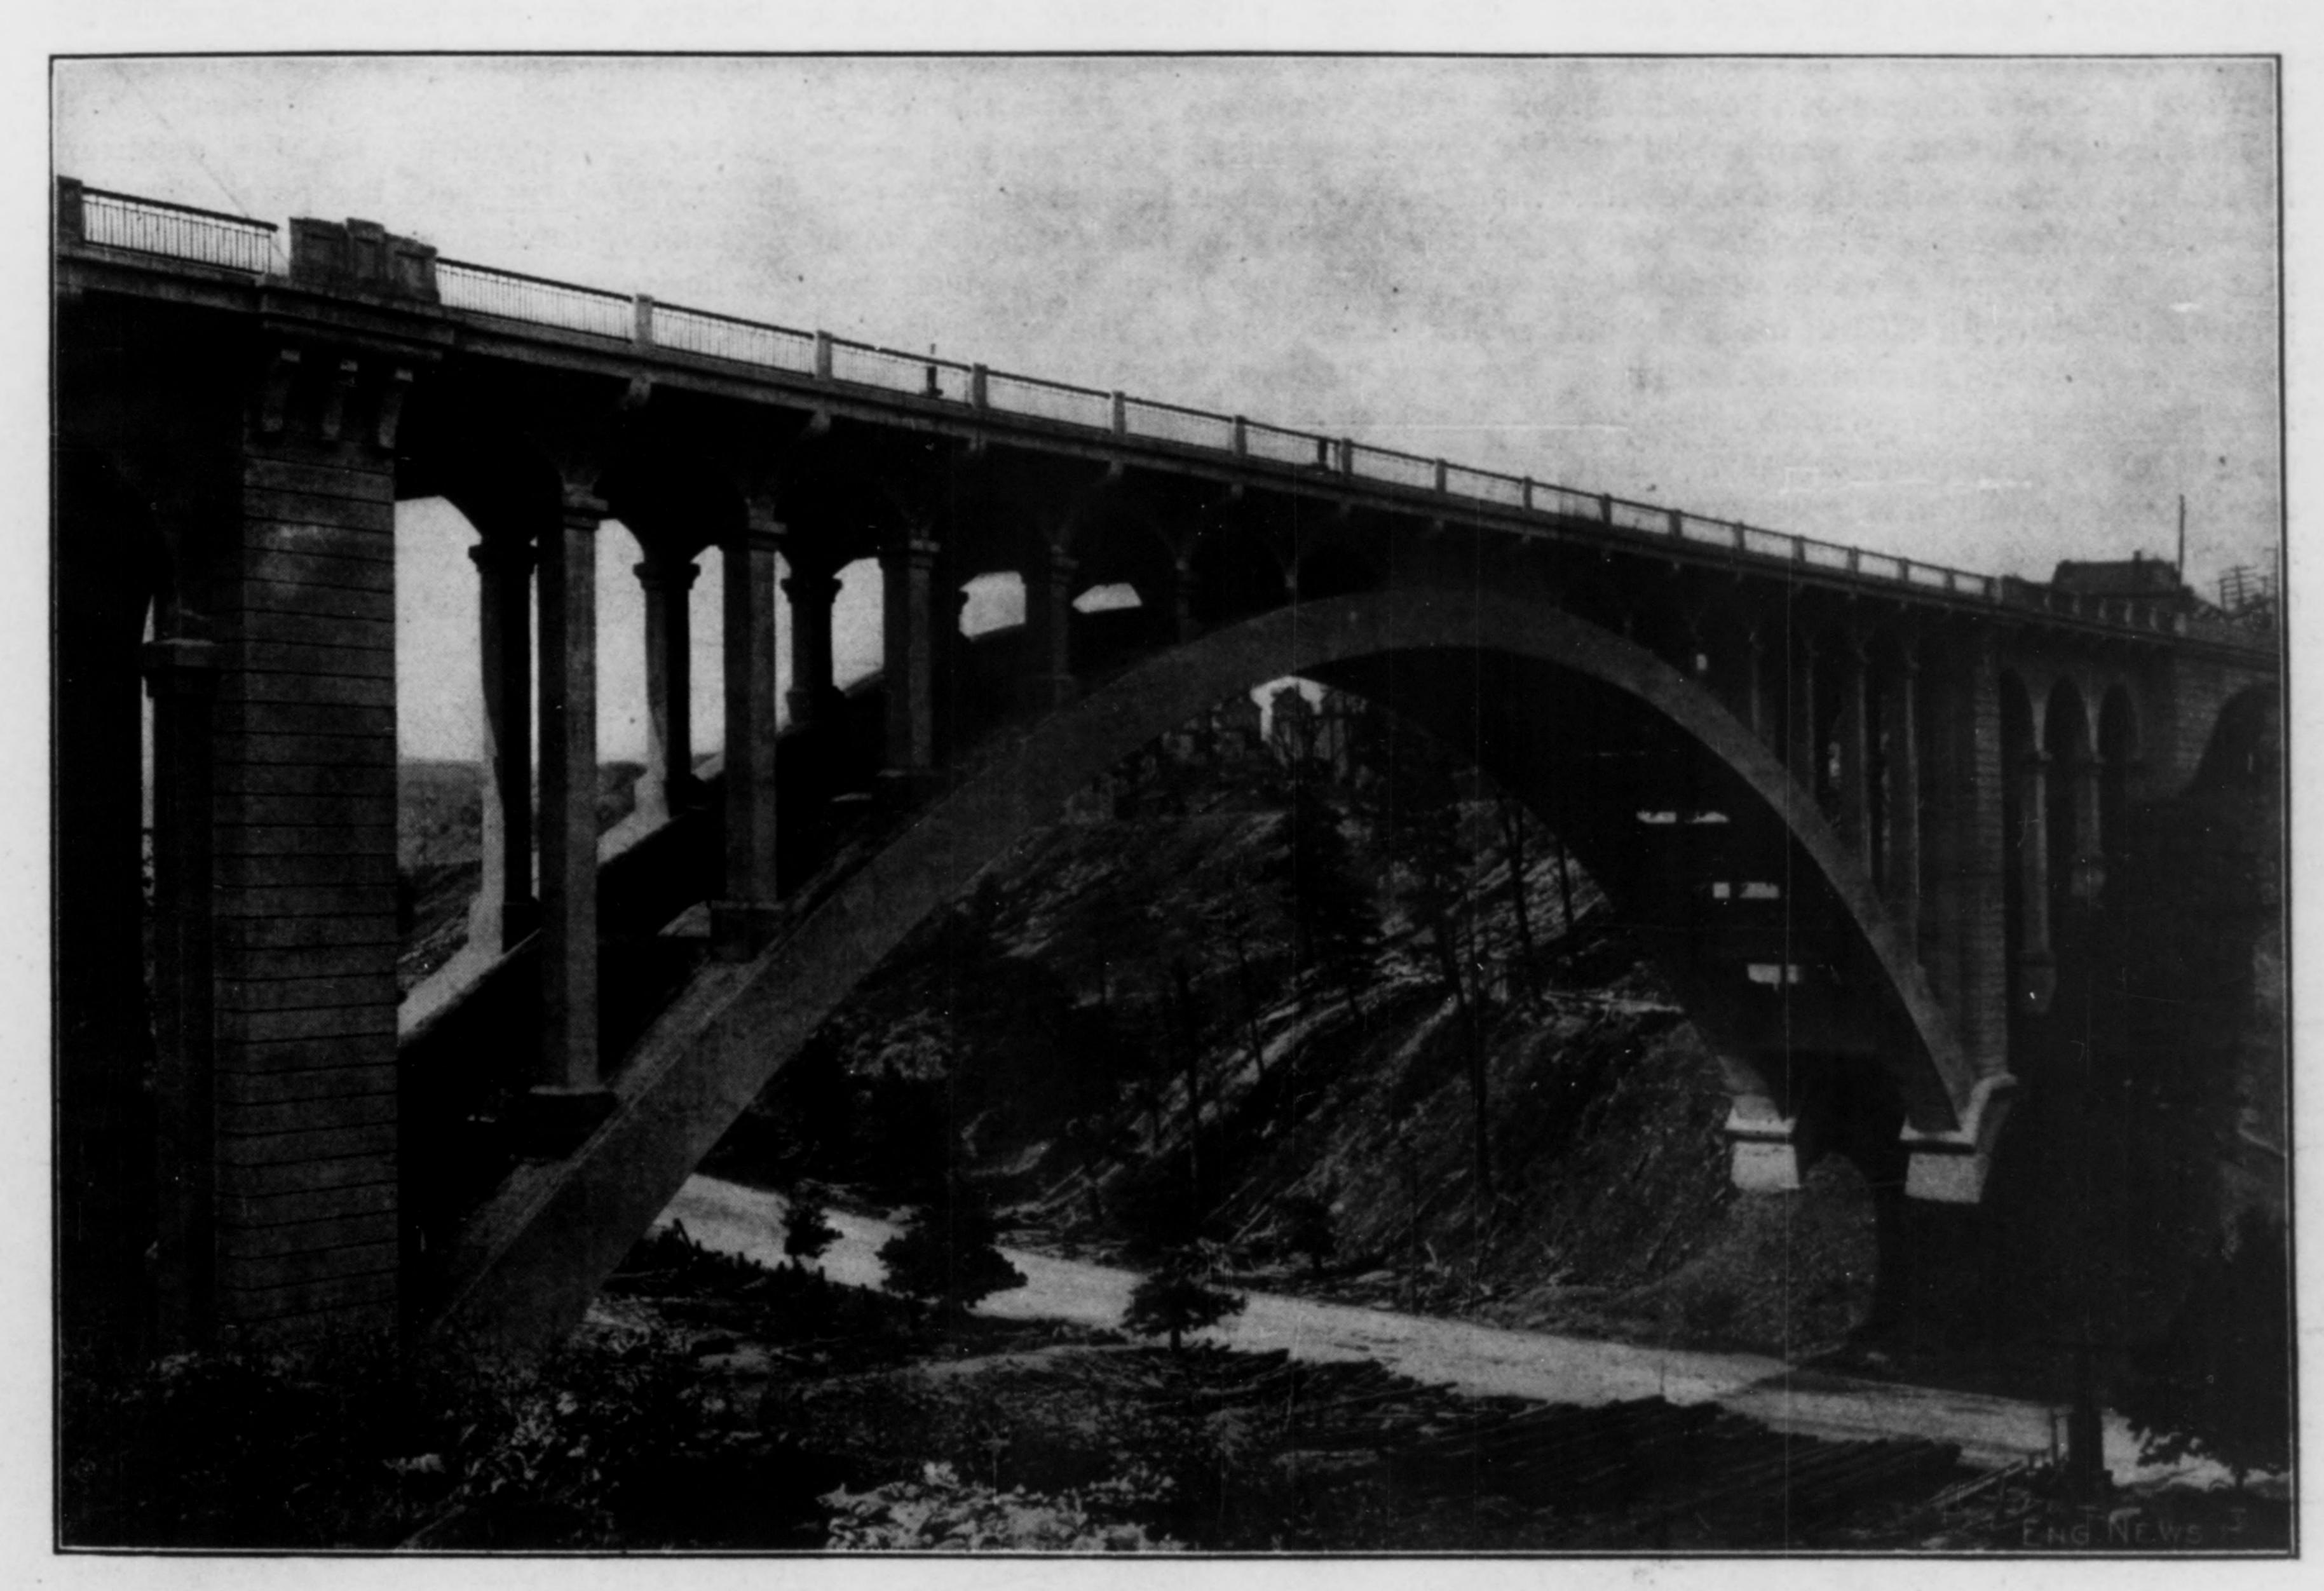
Larimer Avenue Arch Bridge over Washington Boulevard, Pittsburgh, Penn. (Looking northeast.)
